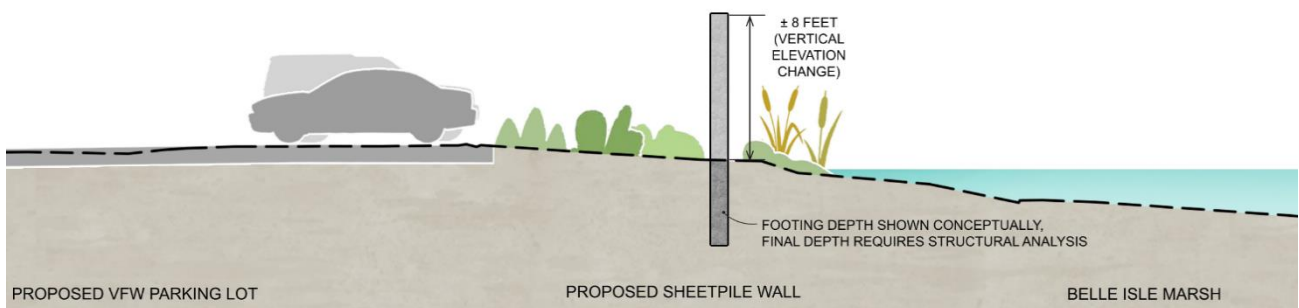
Alternative VFW-2: Sheet Pile Wall—Illustrative Cross Section (Terraink)
